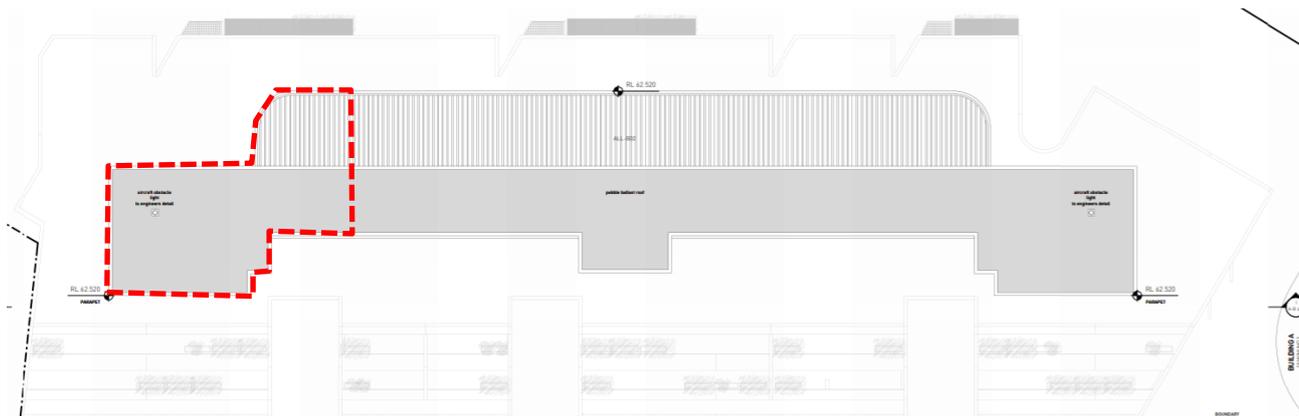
Extent of variation to maximum building height – Building B (shown on roof plan)
